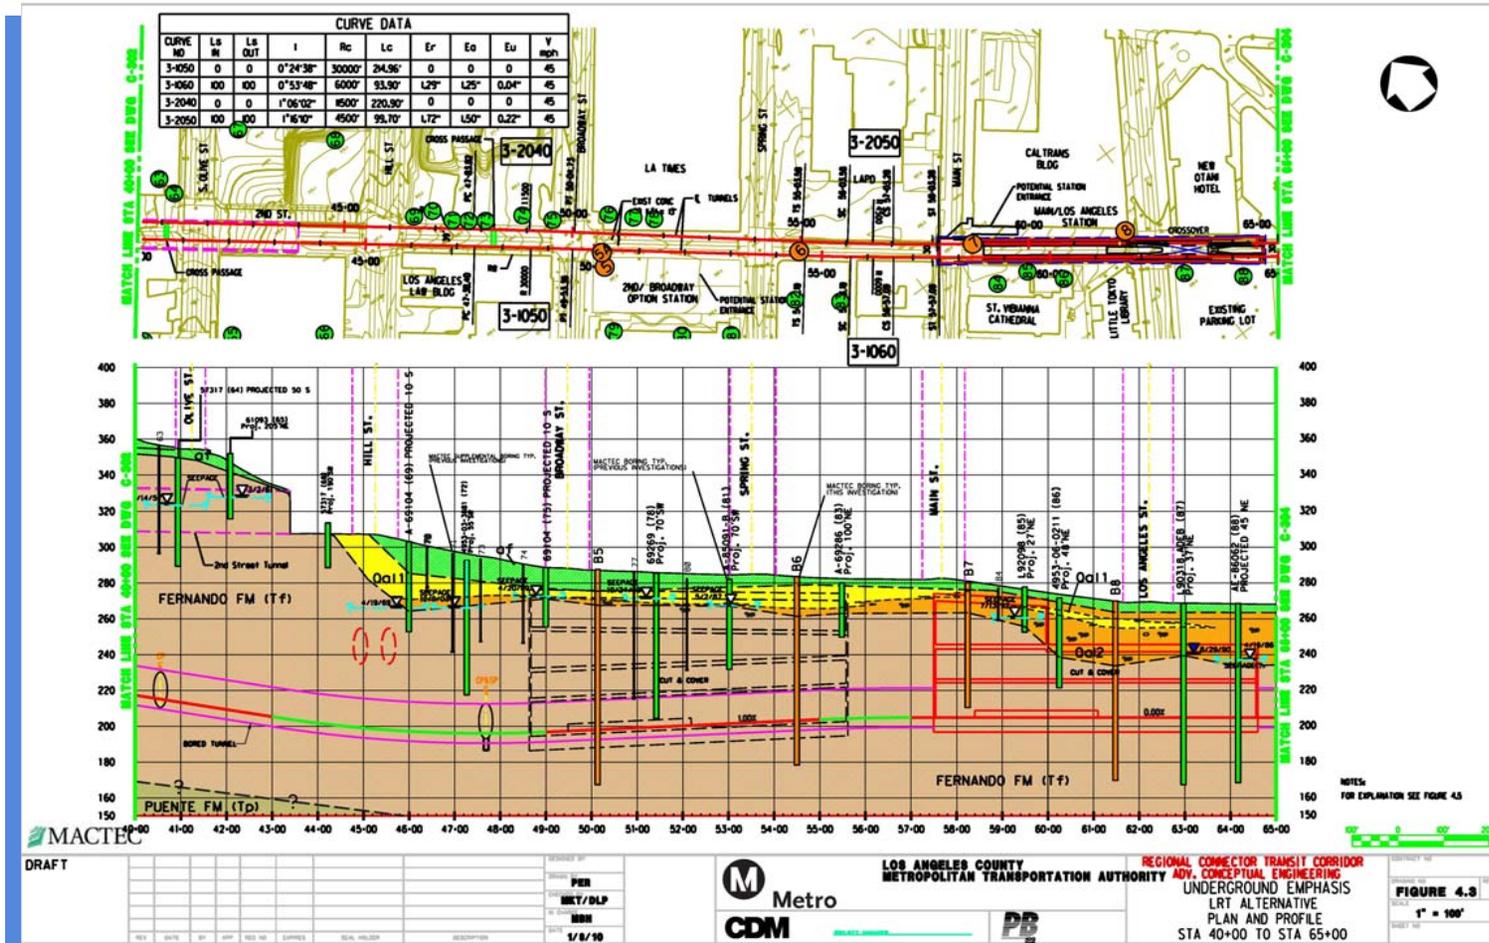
Underground Emphasis LRT Alternative Typical Underground Conditions
